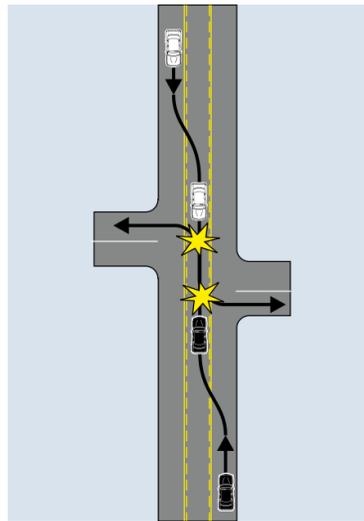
Avoid Locating Driveways on Opposite Sides of the Roadway that Create an Overlap for Left Turns Exiting the Major Roadway
